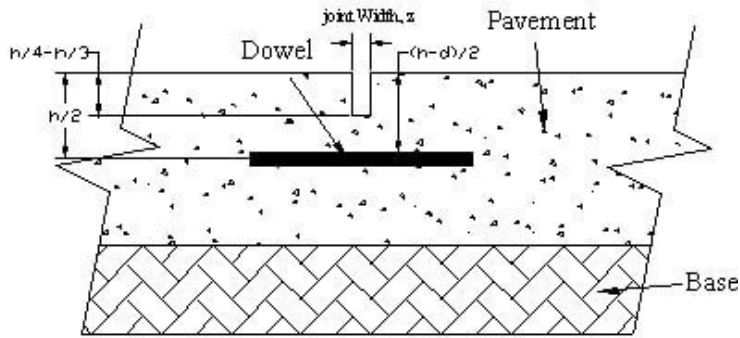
Details of joints in jointed unreinforced concrete pavement [21]
